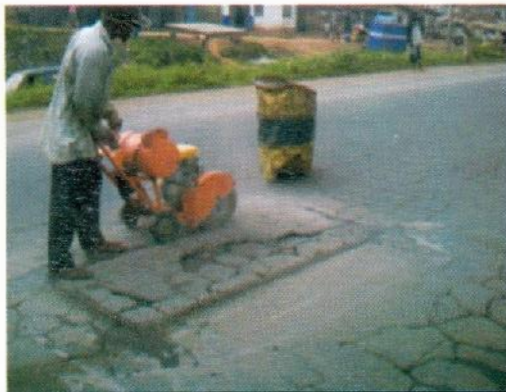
Using pavement cutter to cut pavement surfacing to a depth of about 50 mm.
